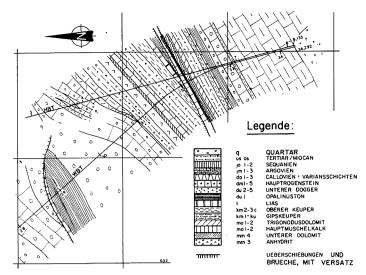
Geologic horizontal section through southern half of Hauenstein-Tunnel (HBT) and Wisenberg-Tunnel (WBT)
